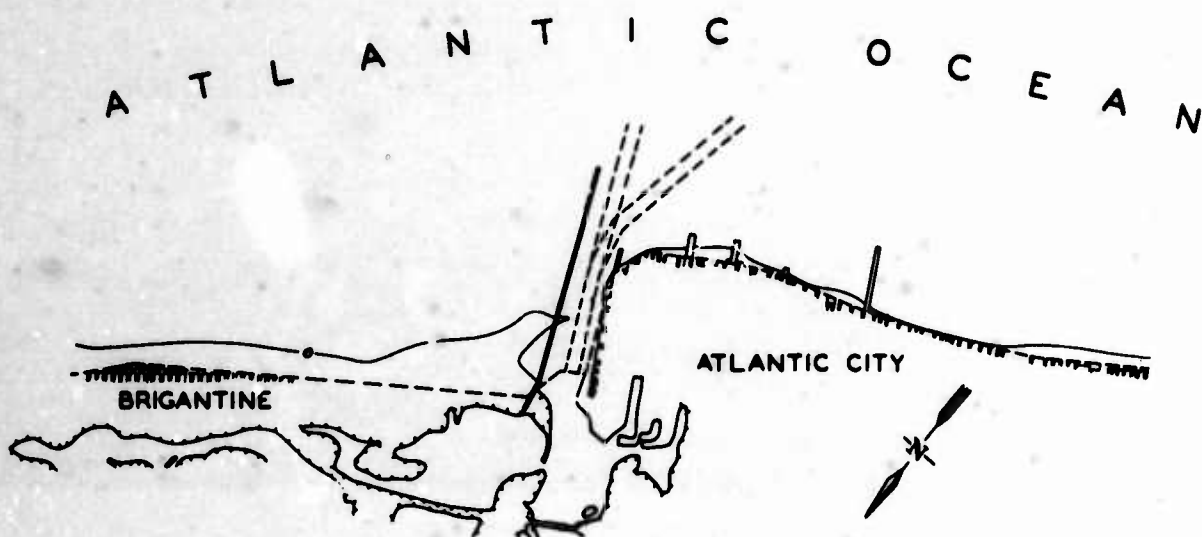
Model jetty plan for Absecon Inlet, New Jersey
